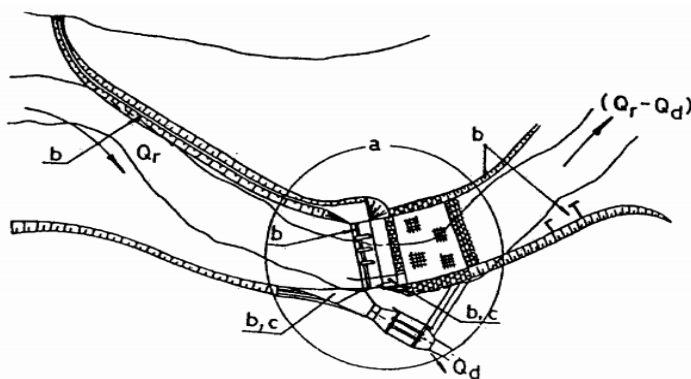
Layout of river diversion structure (Boeriu, 1999)
